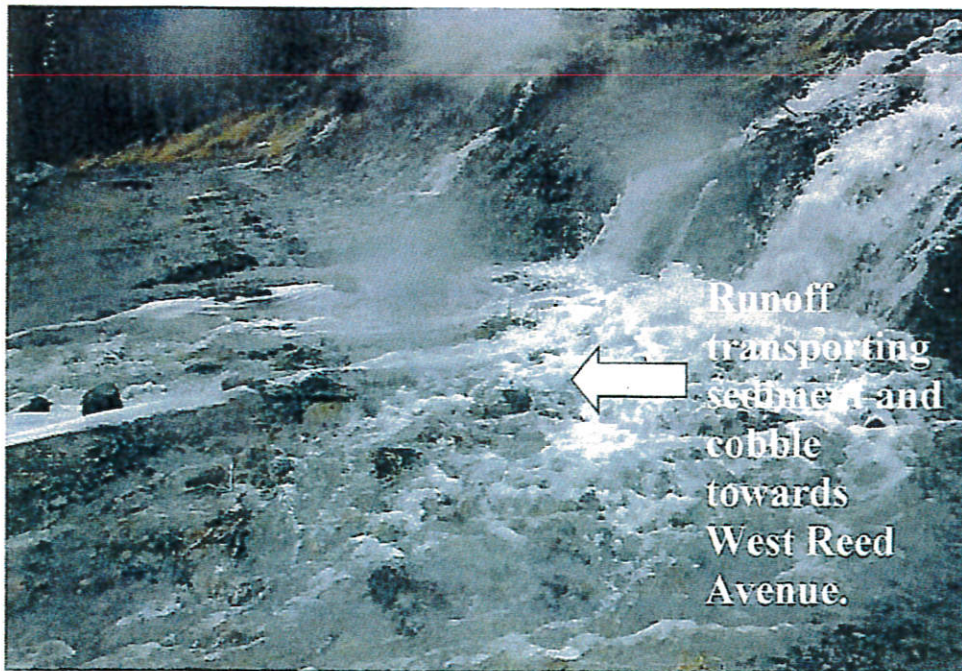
Looking upslope along at the Caltrans culvert on the east end of the hillside above West Reed Avenue. Photo taken June 6, 2006.
